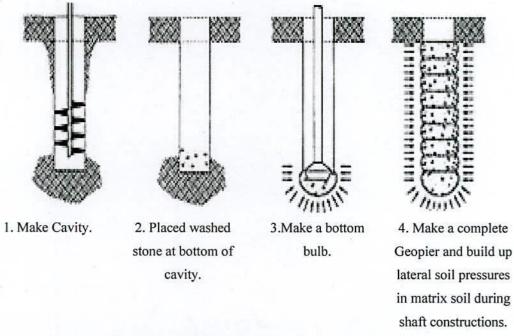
Three step installation process of Geopier (After Geopier 2003)
